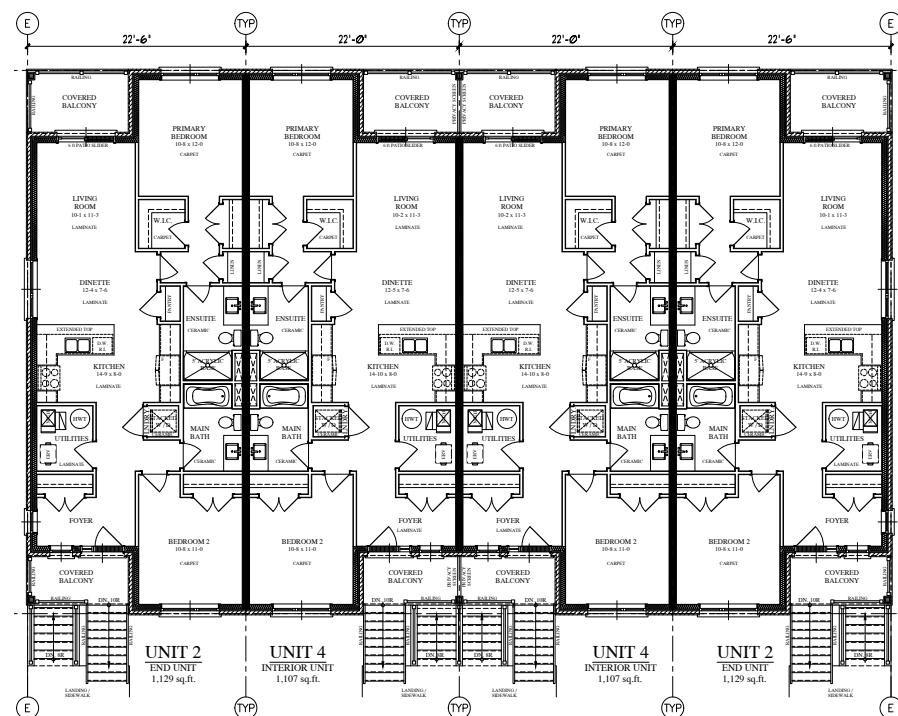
Stacked Bangalow Townhome Upper Level Floor Plans, prepared by Reids Heritage
